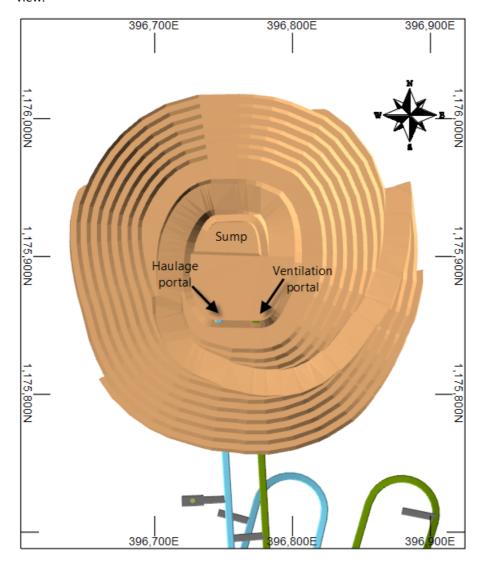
Haulage and Ventilation Portal Locations – Plan View GBE Pit
